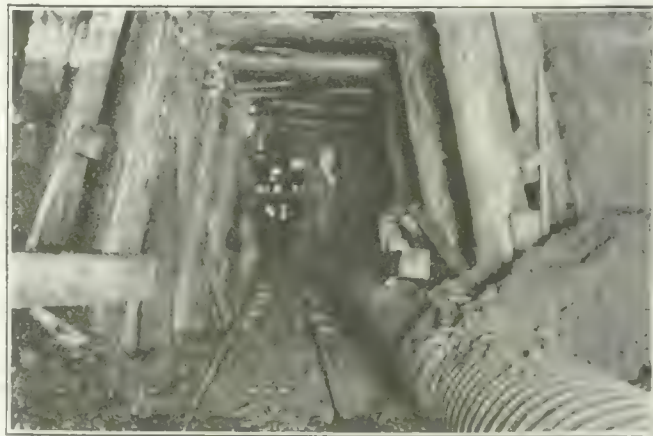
PILOT TUNNEL THROUGH WET-SAND SECTION
